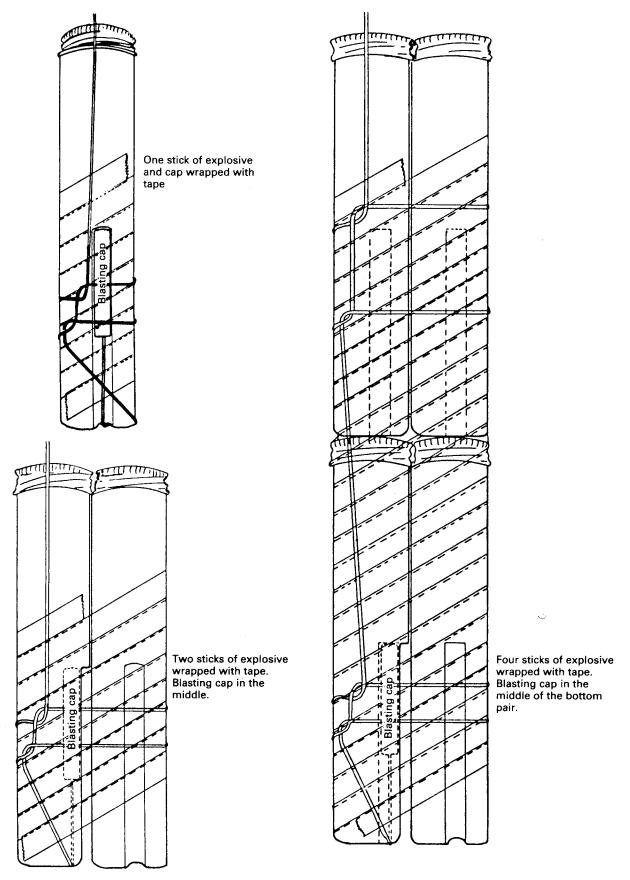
Assembly of explosive cartridges and electric blasting caps.
